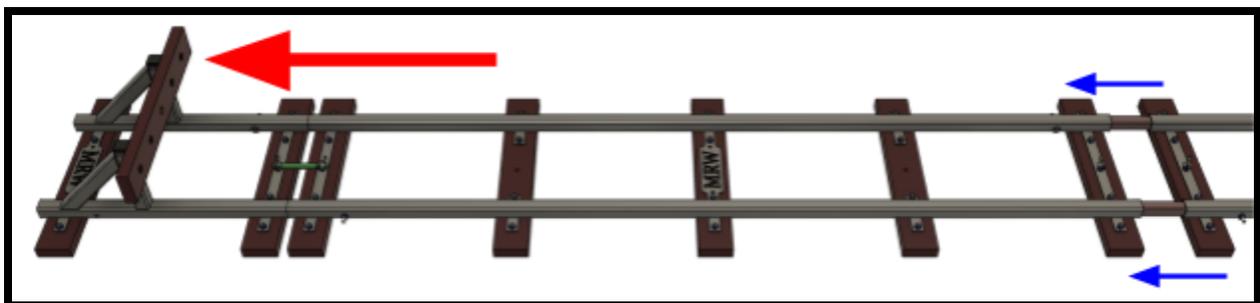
Buffer stop connected to track panels with “Track Panel Tie Bar”.
